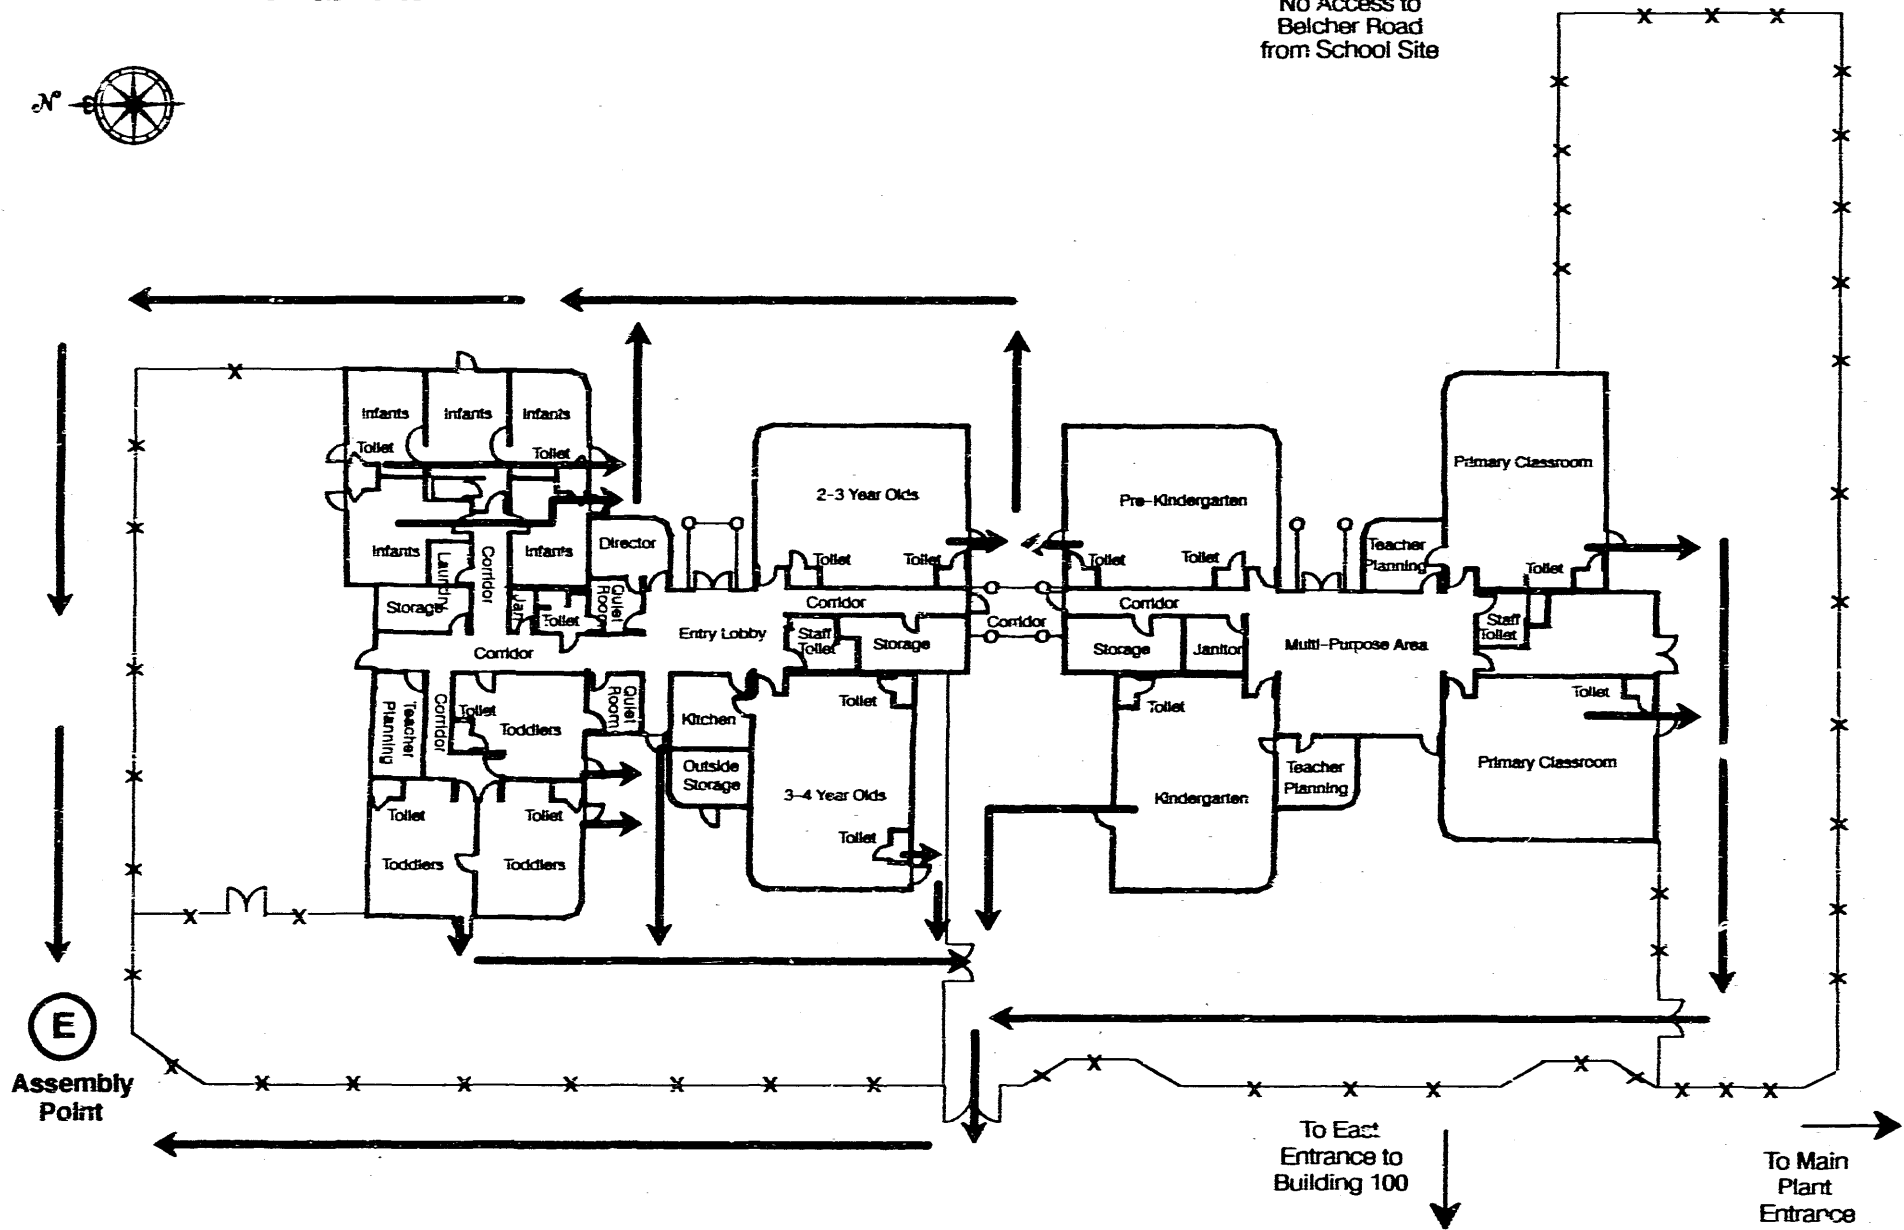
Pinellas Plant Child Development Center/Partnership School Floor Plan and Evacuation Routes
